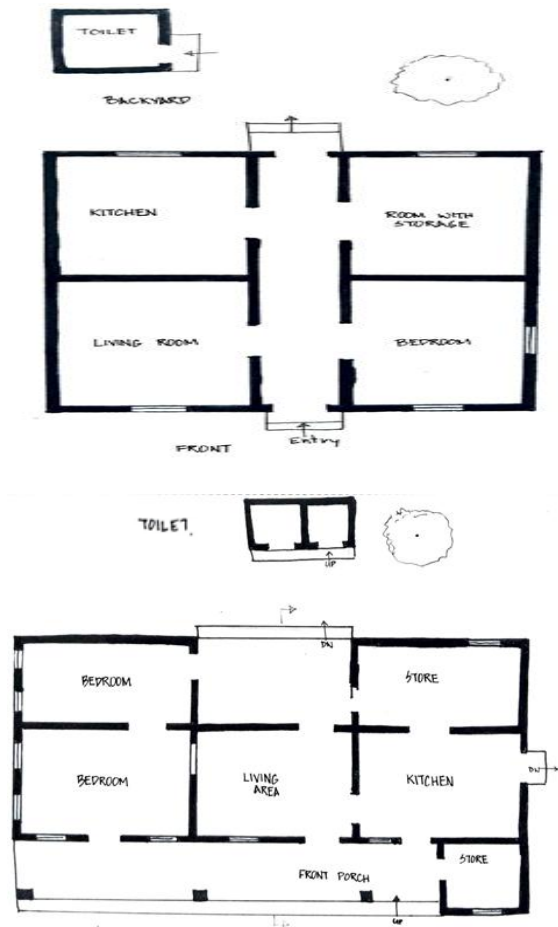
Plans of typical vernacular dwellings (Source: Authors)
